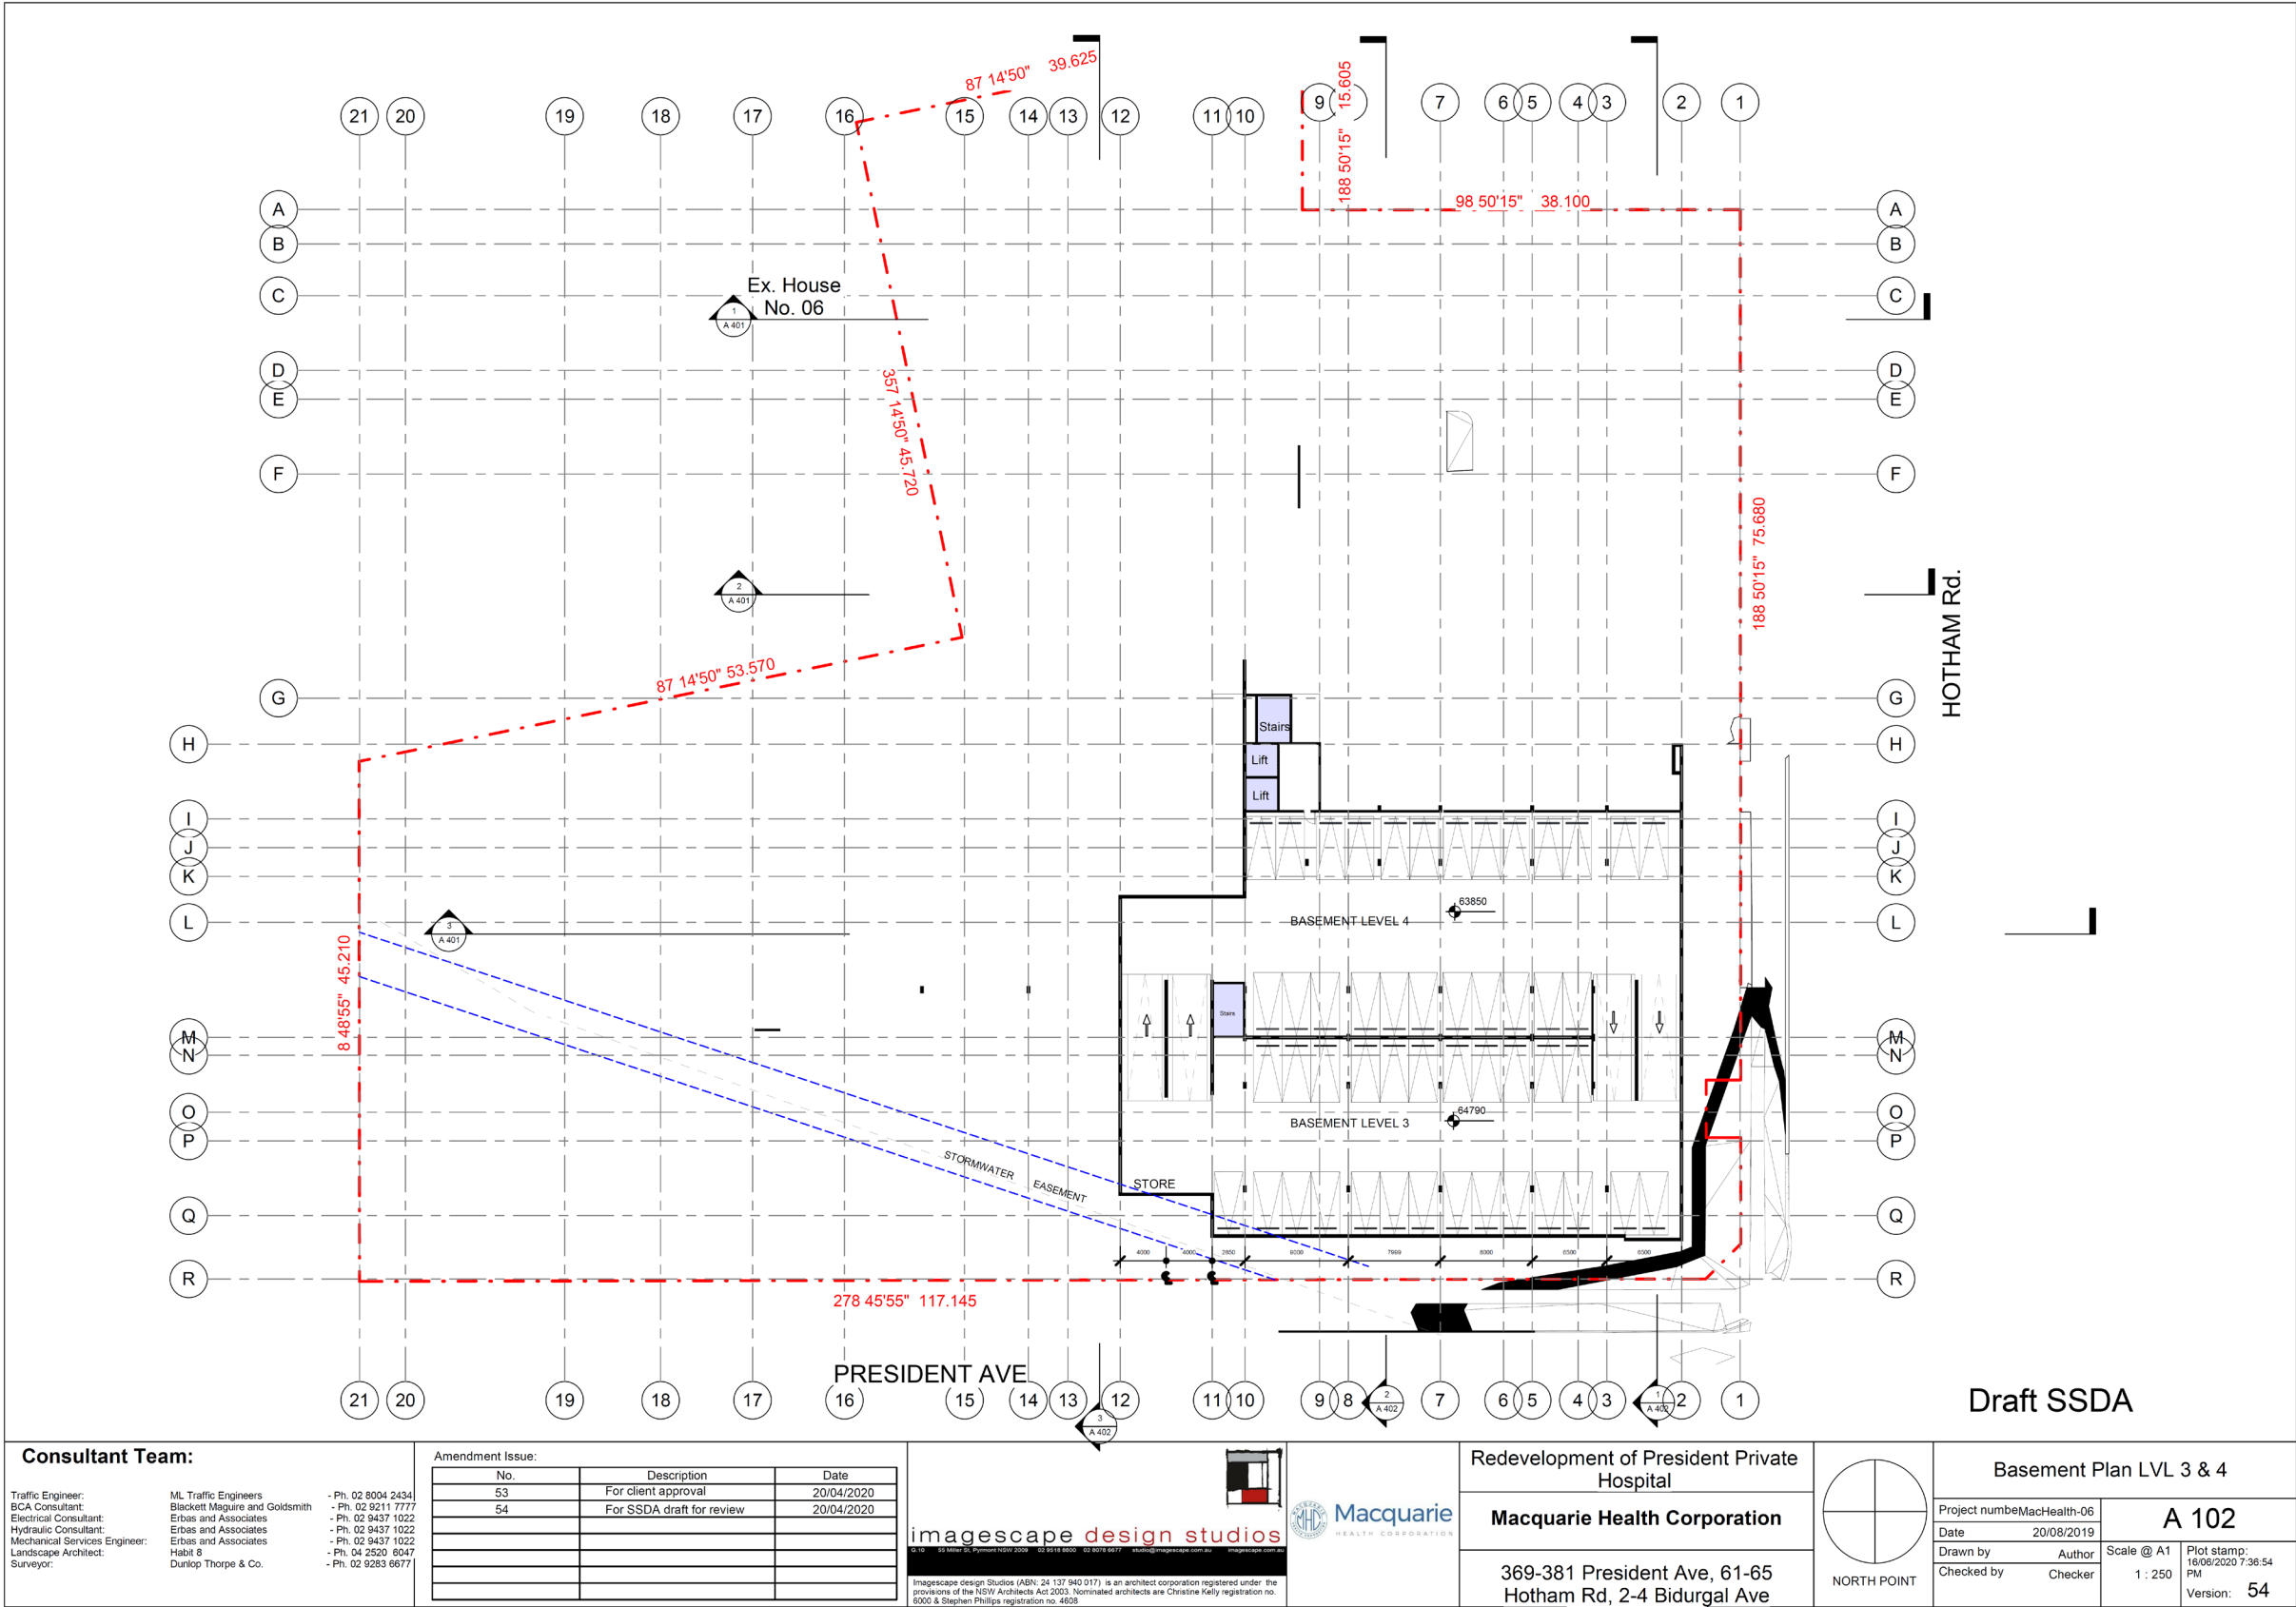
Basement Plan LVL 3 & 4.
